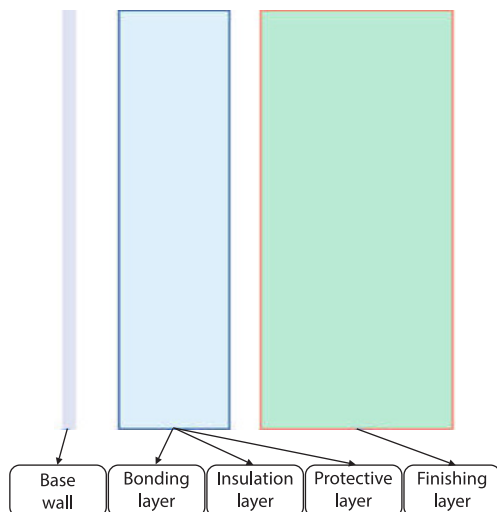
Basic construction diagram of new autoclaved aerating technology wall material
